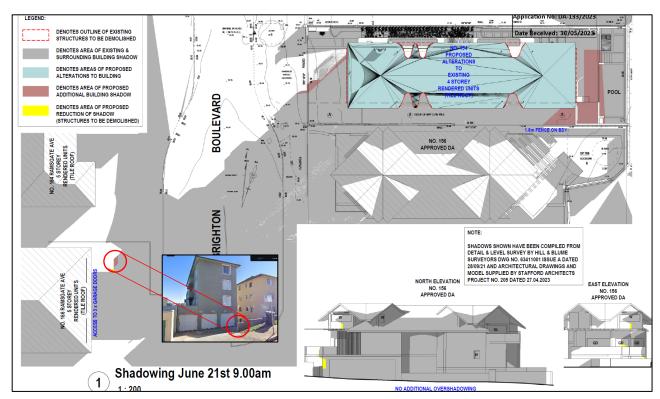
Shadowing cast from the proposed development at 9am on June 21. (Source: Cad Draft, 2023)
